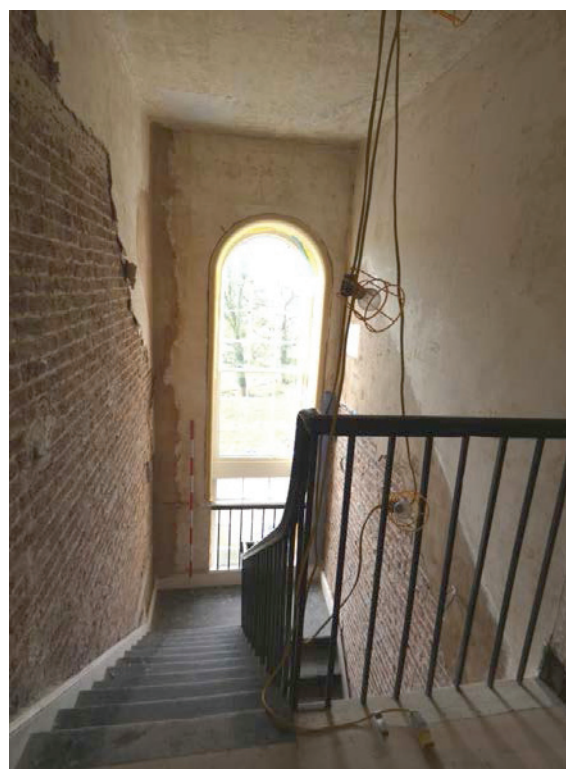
The south elevation in second floor Room 6, viewed from the north-west
